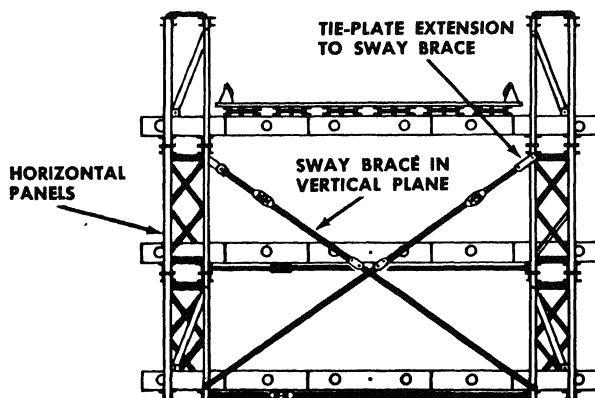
Sway-brace cross bracing in two-story panel crib pier.
